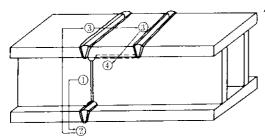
Weld sequence for girder-to-girder connection
